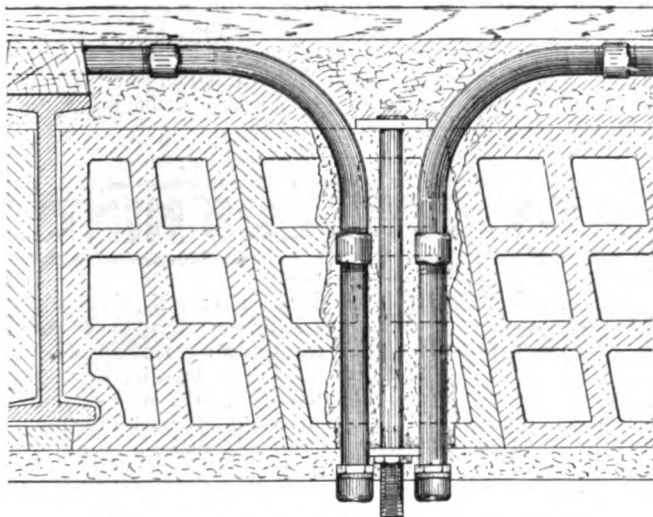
METHOD OF INSTALLING ERICKSON'S CEILING OUTLET.
